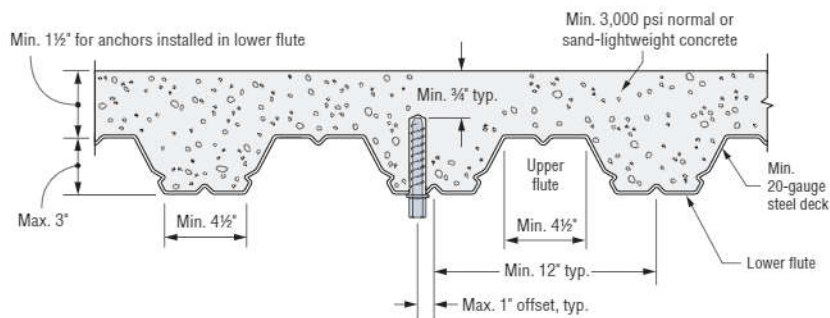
THD50234RH Installation in Concrete over Metal Deck
